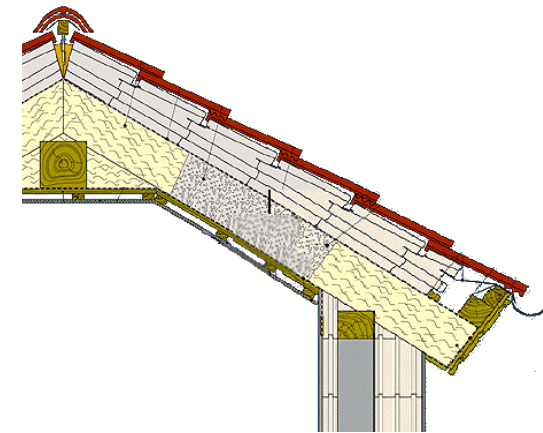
20 – Inclined roof with insulation between and above the rafters
